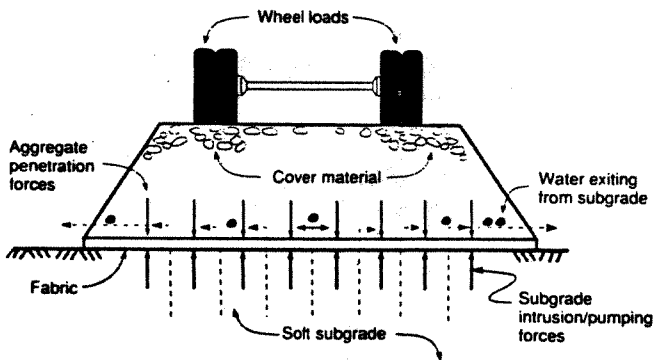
Geotextile in separation application. Traffic loads pump water upward. Geotextile restricts movement of fines, permits water drainage.
